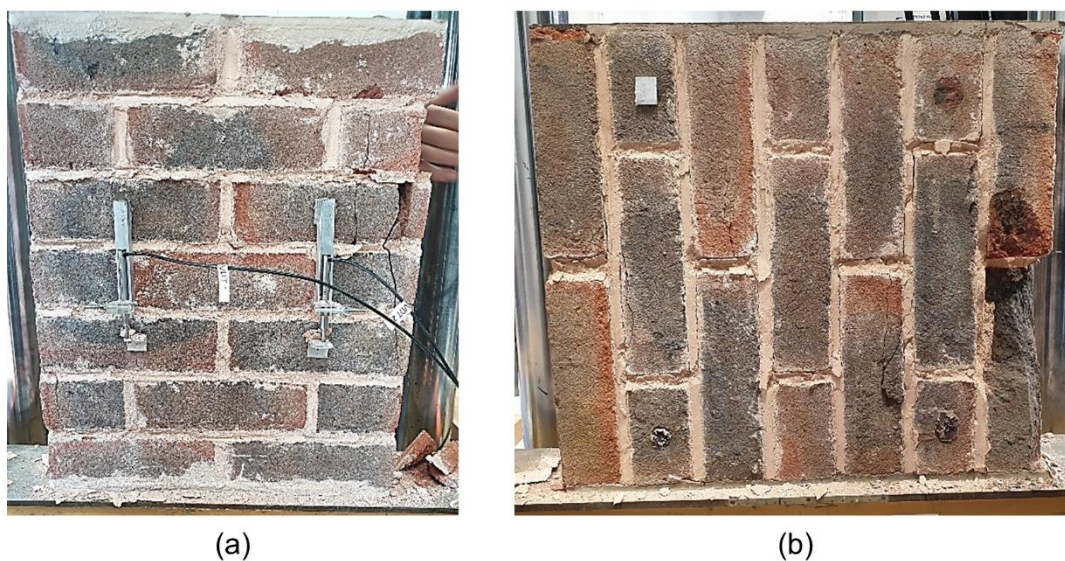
Failure of masonry wallettes in compression: (a) load perpendicular to bed joints (b) load parallel to bed joints.
